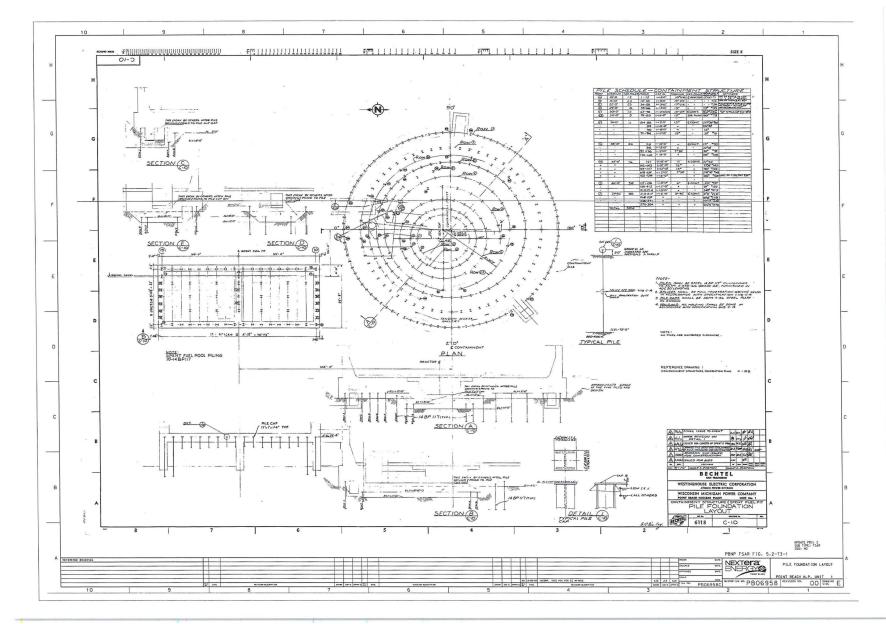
PILE FOUNDATION LAYOUT
